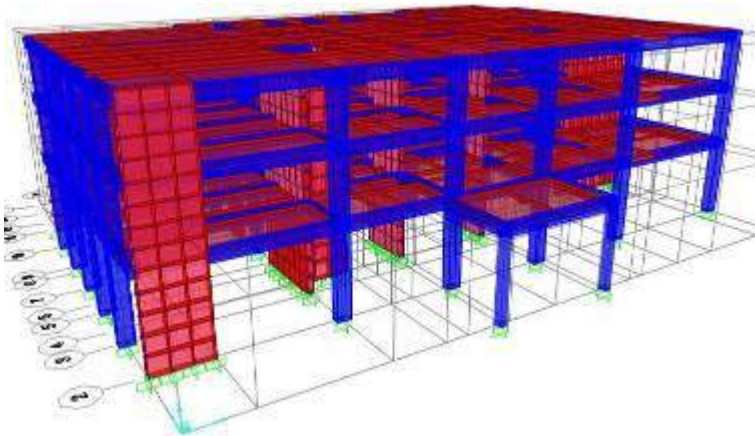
Frames with Shear Walls and Reinforcement Concrete Columns 3D View
